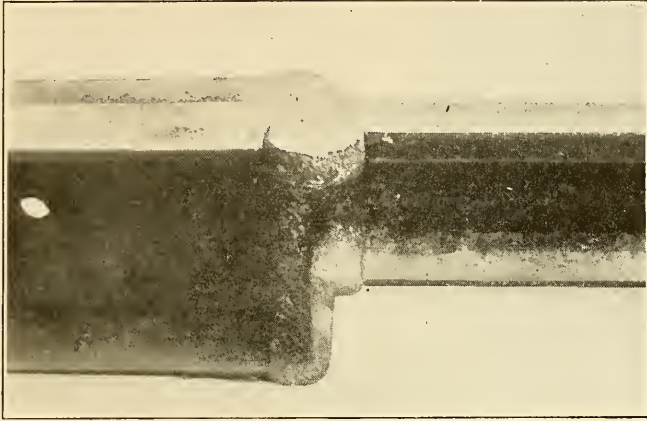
Welded Compromise Joint Between T-Rail and Grooved Rail.
